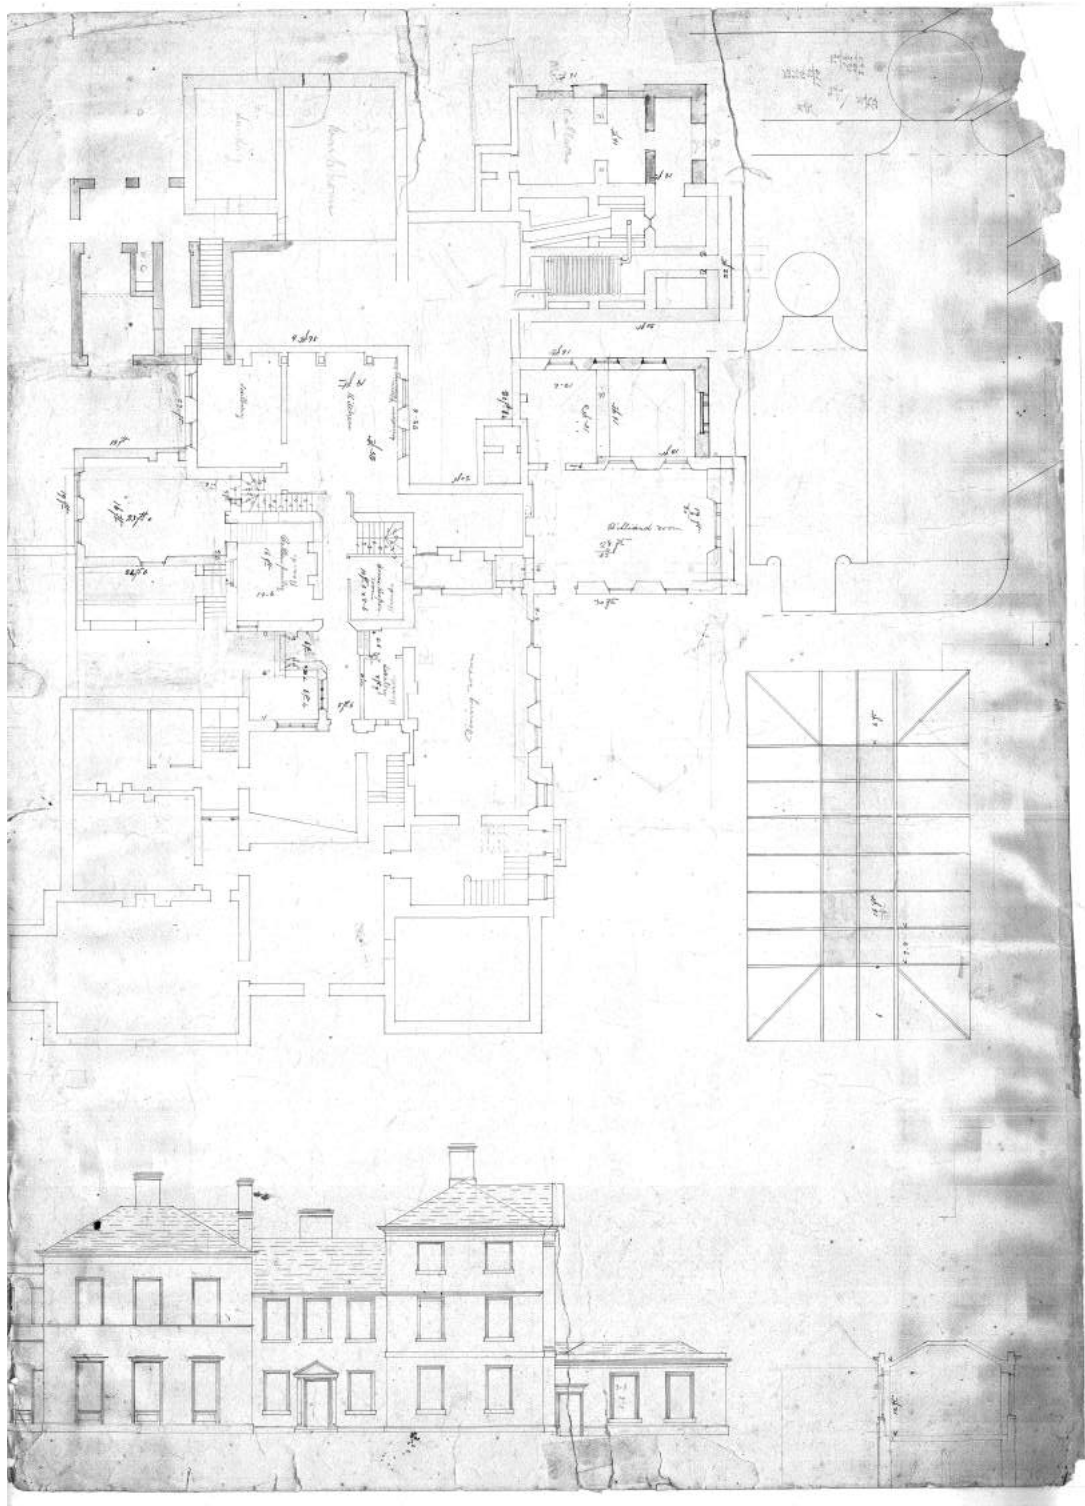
Proposal drawing for Butler's Pantry (n.d.; not built)
